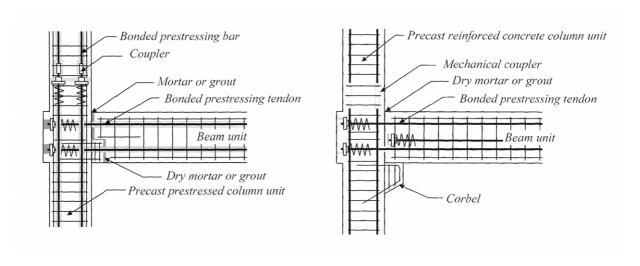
General reinforcing details of equivalent monolithic post-tensioned system 2
